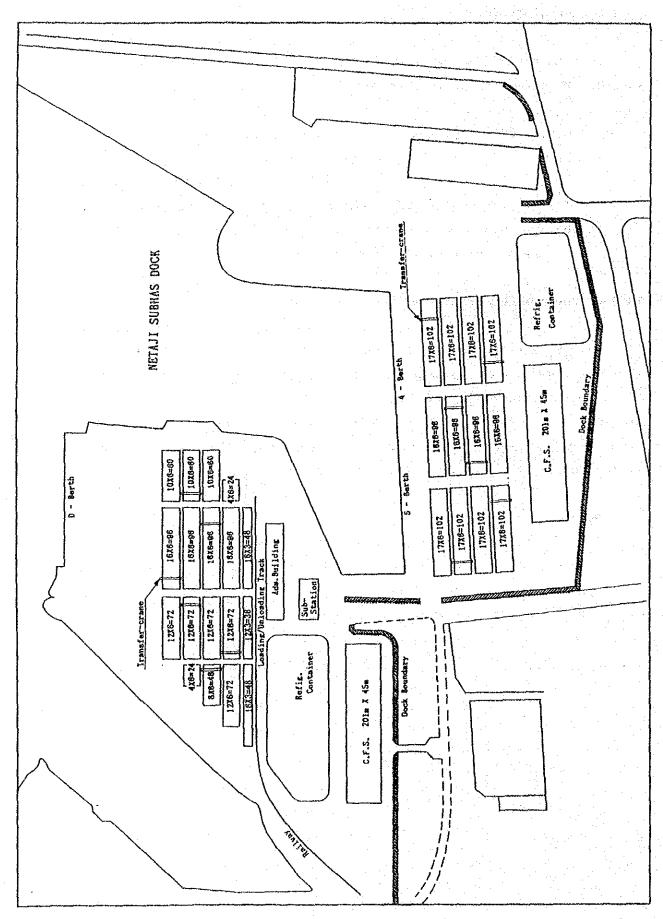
Layout Plan of Container Yard at Calcutta
